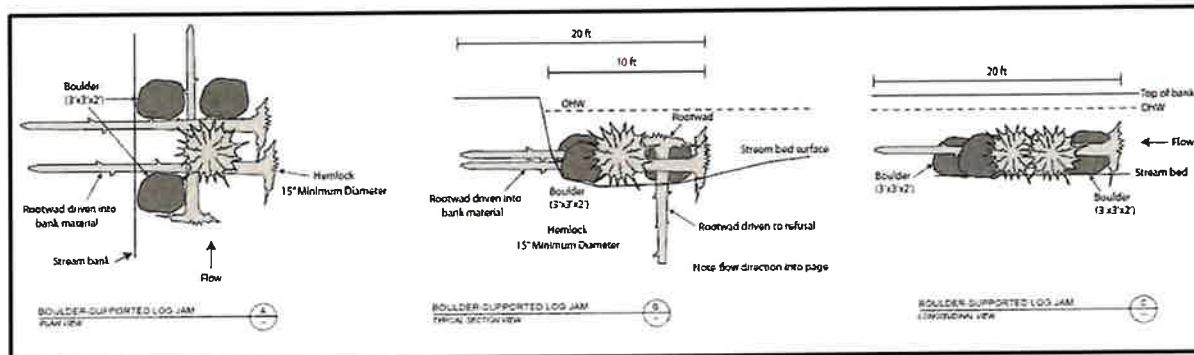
Design typical for boulder supported log jam to be used to restore Atlantic salmon and brook trout habitat on the South Branch. Design typicals for all log structures found in Appendix 1.
